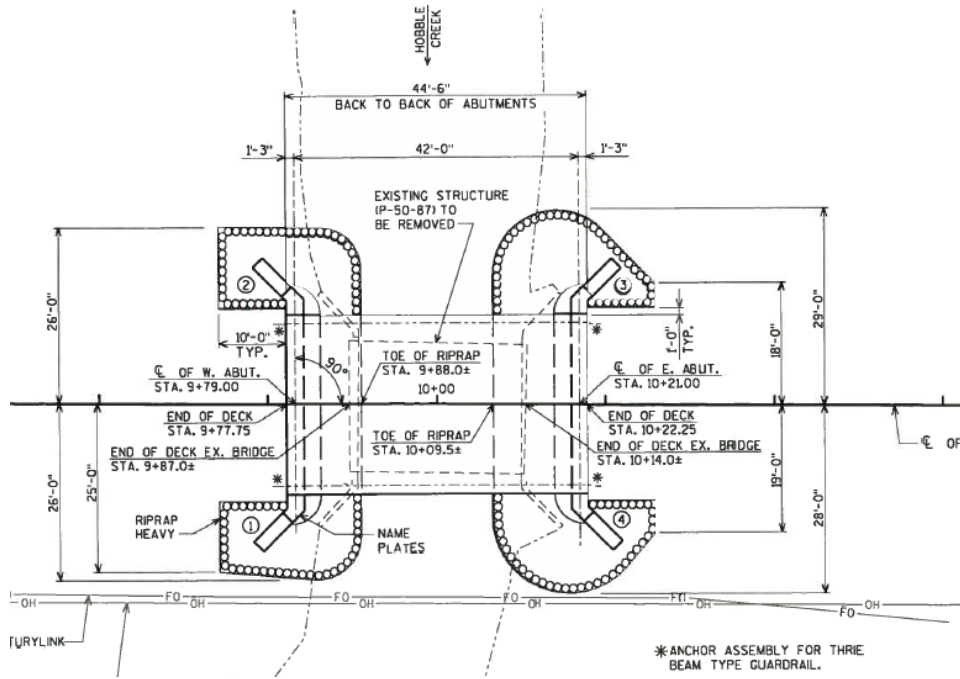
Hobbles Creek Bridge plan view (from project plans)
